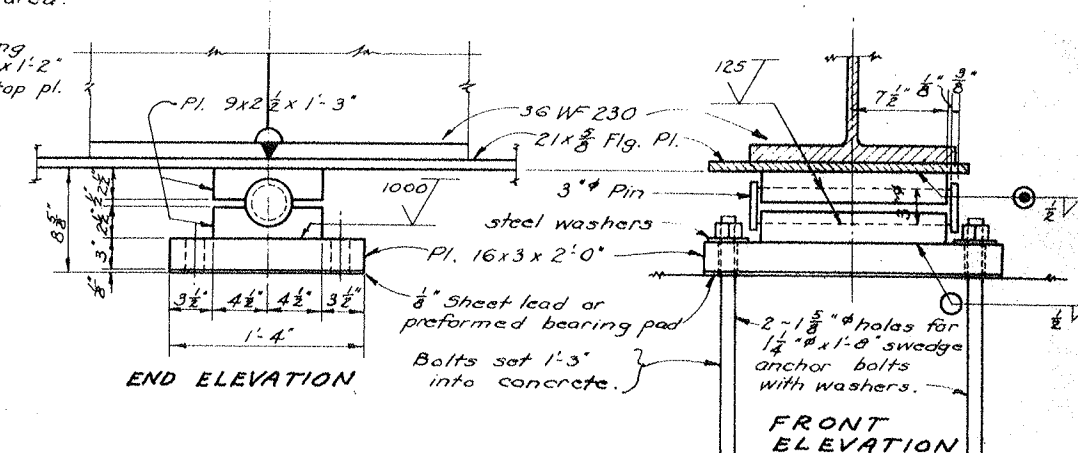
DETAILS OF BEARING ASSEMBLY EP-100 (24 REQ)
